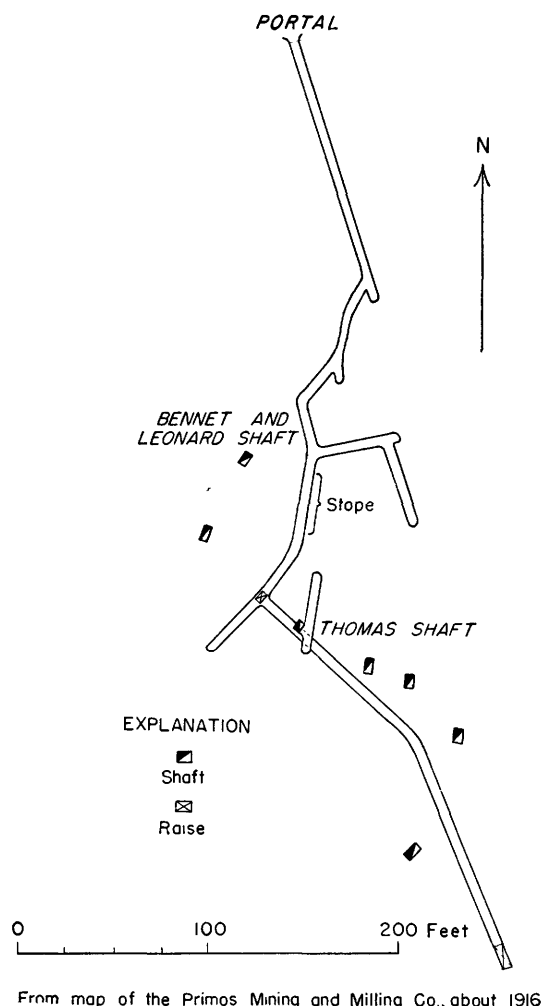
Plan of the Greenhorn tunnel, Boulder County, Colo., about 1916.
